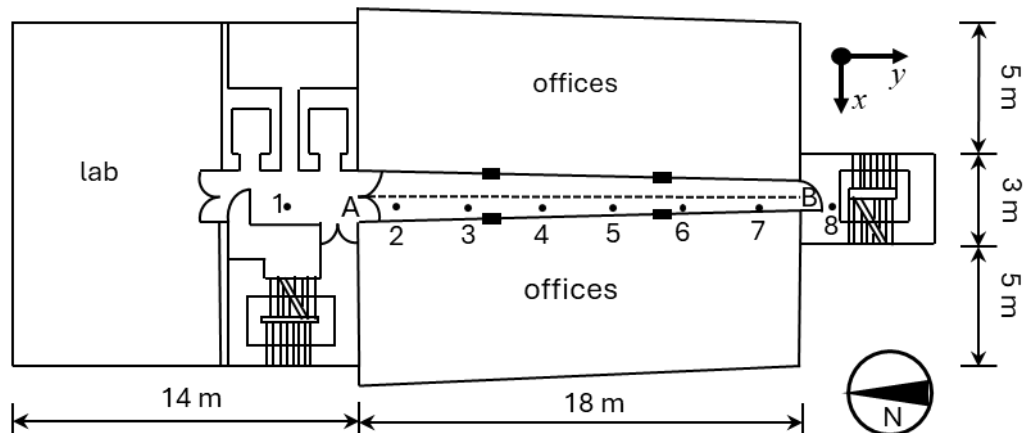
Typical floor plan below Level 8. Dot – test point; black box – column.
